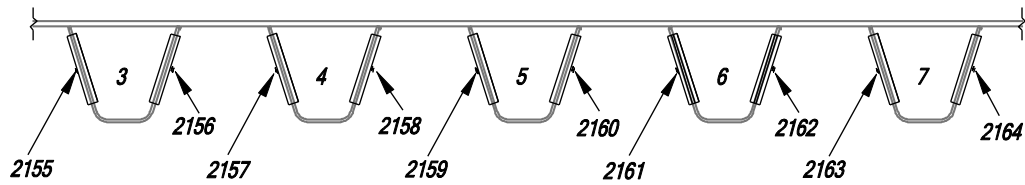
Stress along the rib-to-bulkhead plate weld toe at Rib 3 and gauge placement plan
